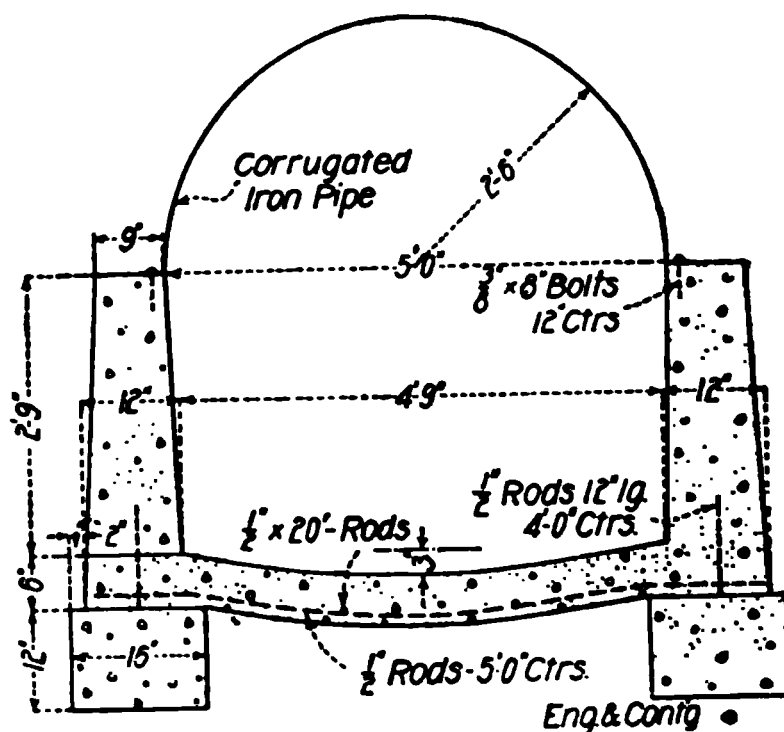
Combination corrugated pipe arch and reinforced concrete invert culvert.
